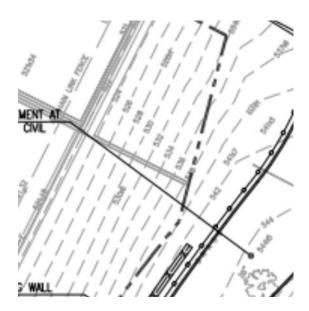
Away side hill elevations (Photo by Landscape Specifications Plan LA-2: Sports and Recreation Center)
